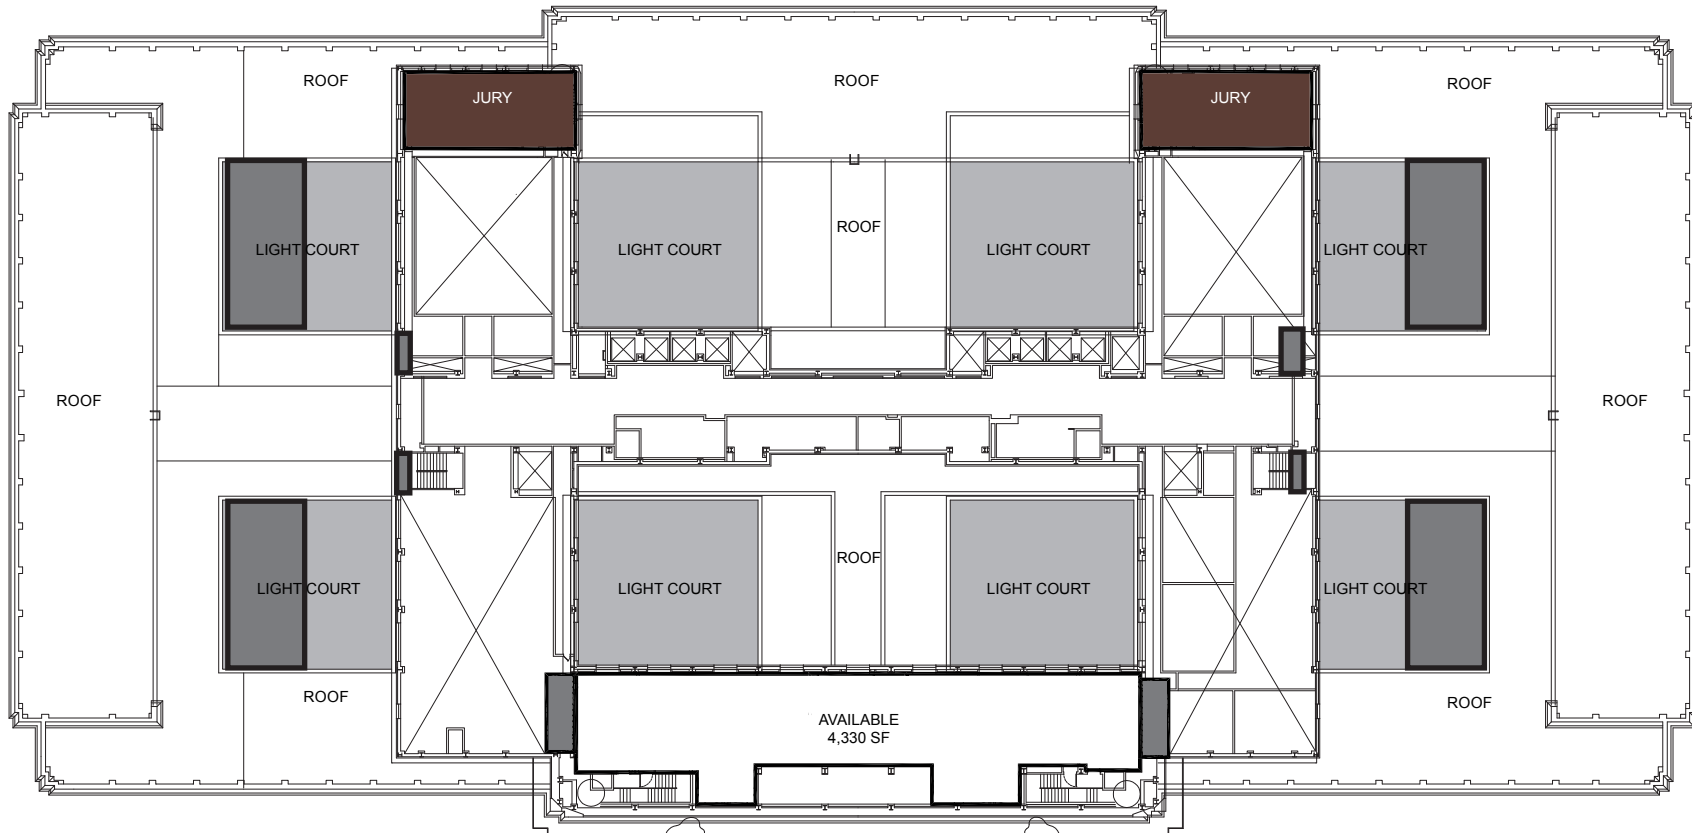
Seventh Floor Plan - Historic Courthouse - Scenario 1
